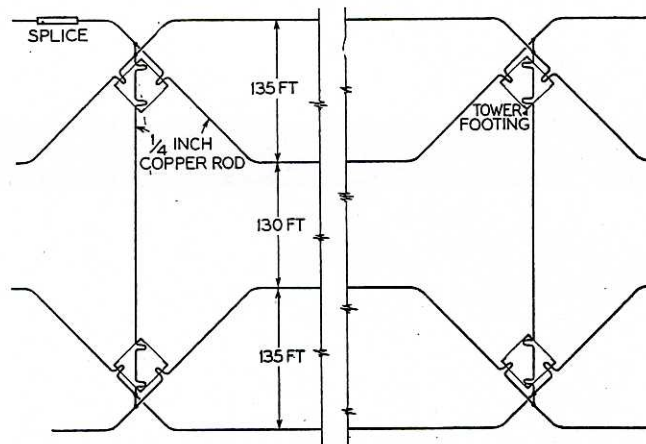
Typical counterpoise layout for single circuit tower section of line
